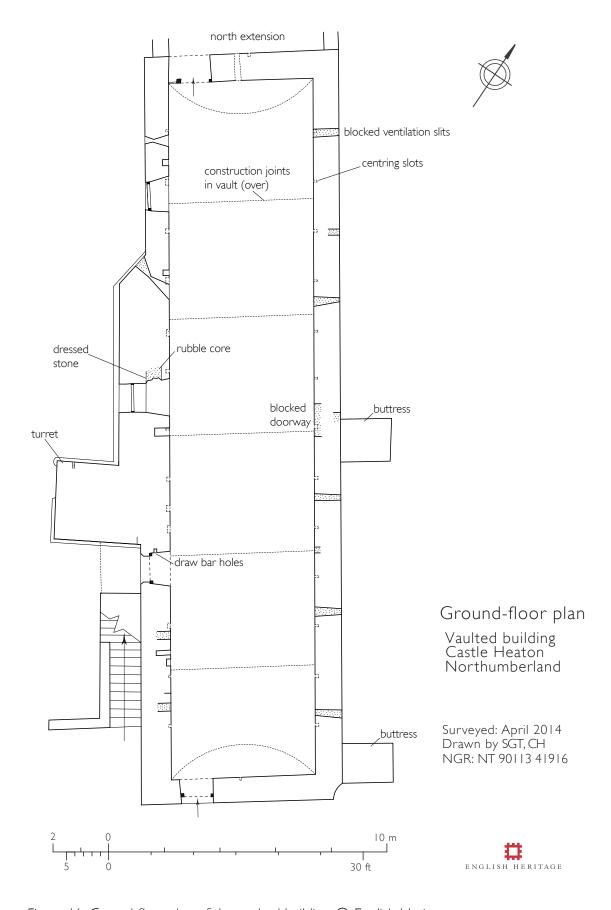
Ground-floor plan of the vaulted building, © English Heritage.
